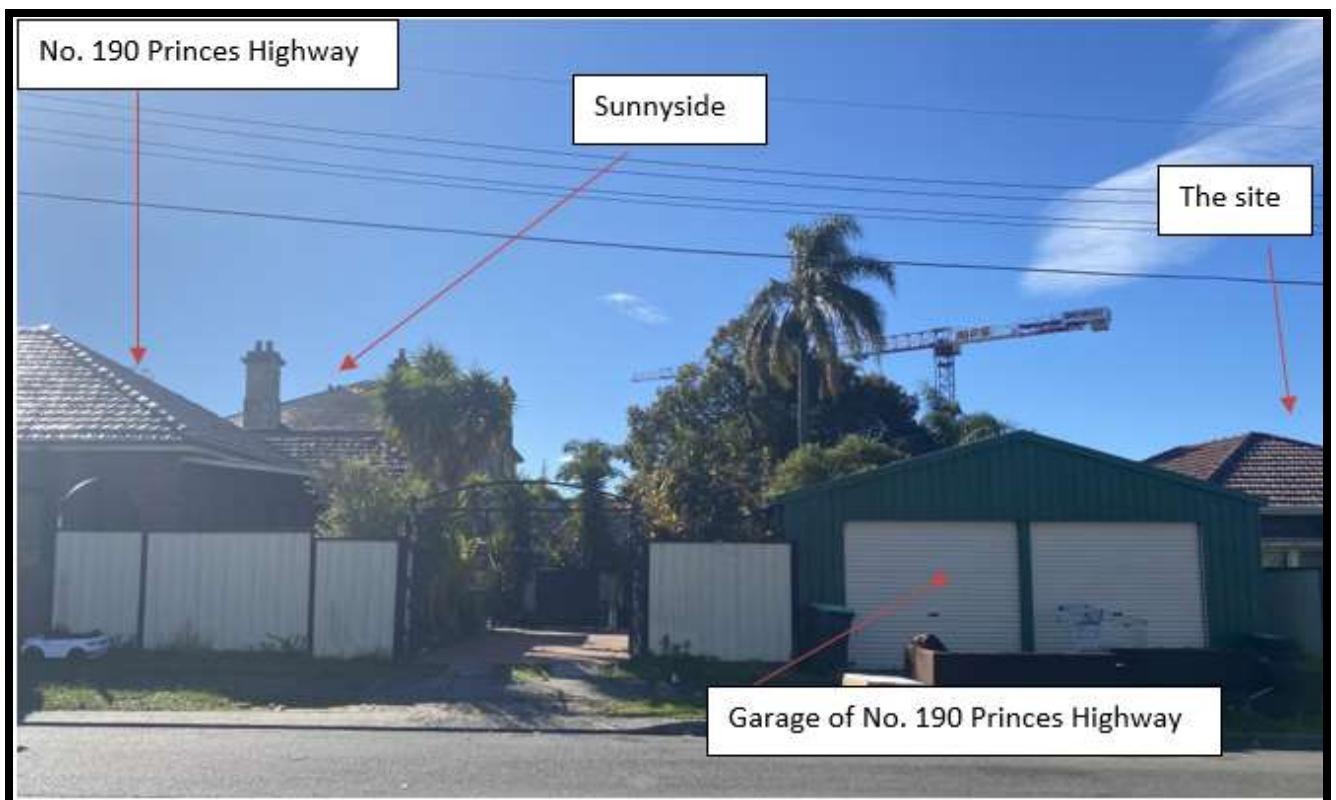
North-western neighbour No. 190 Princes Highway (cnr Lacey Street)
